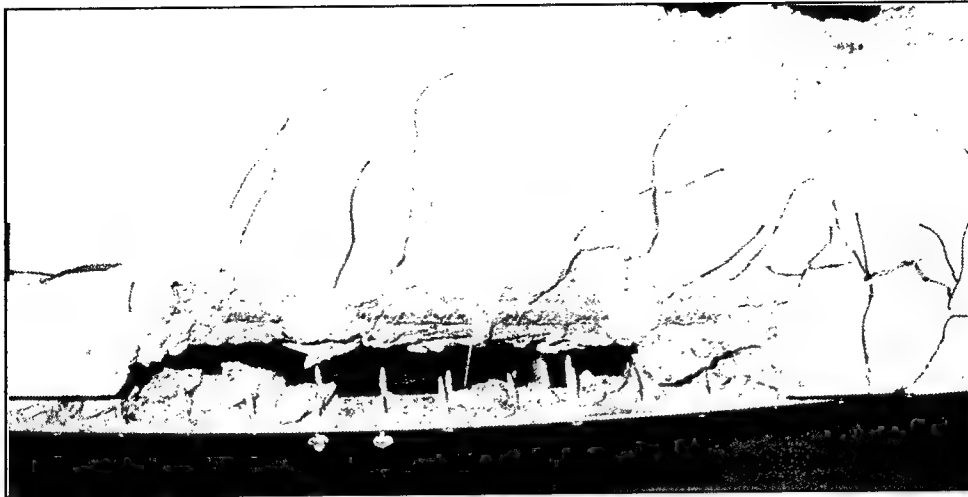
After testing, large chunks of concrete had fallen out of beam H1.5-4-Y-AL42D
